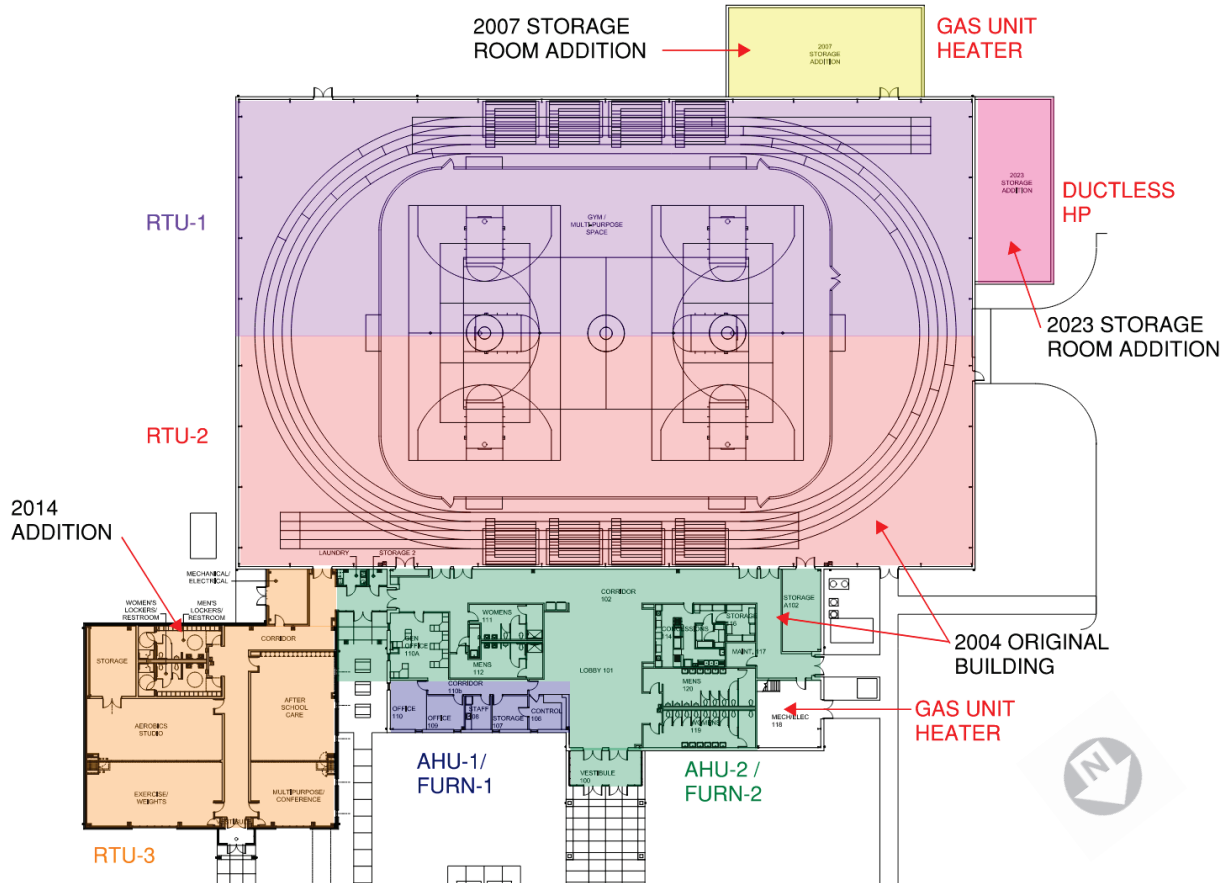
Building Keyplan and HVAC Zoning Diagram (Not to Scale)
